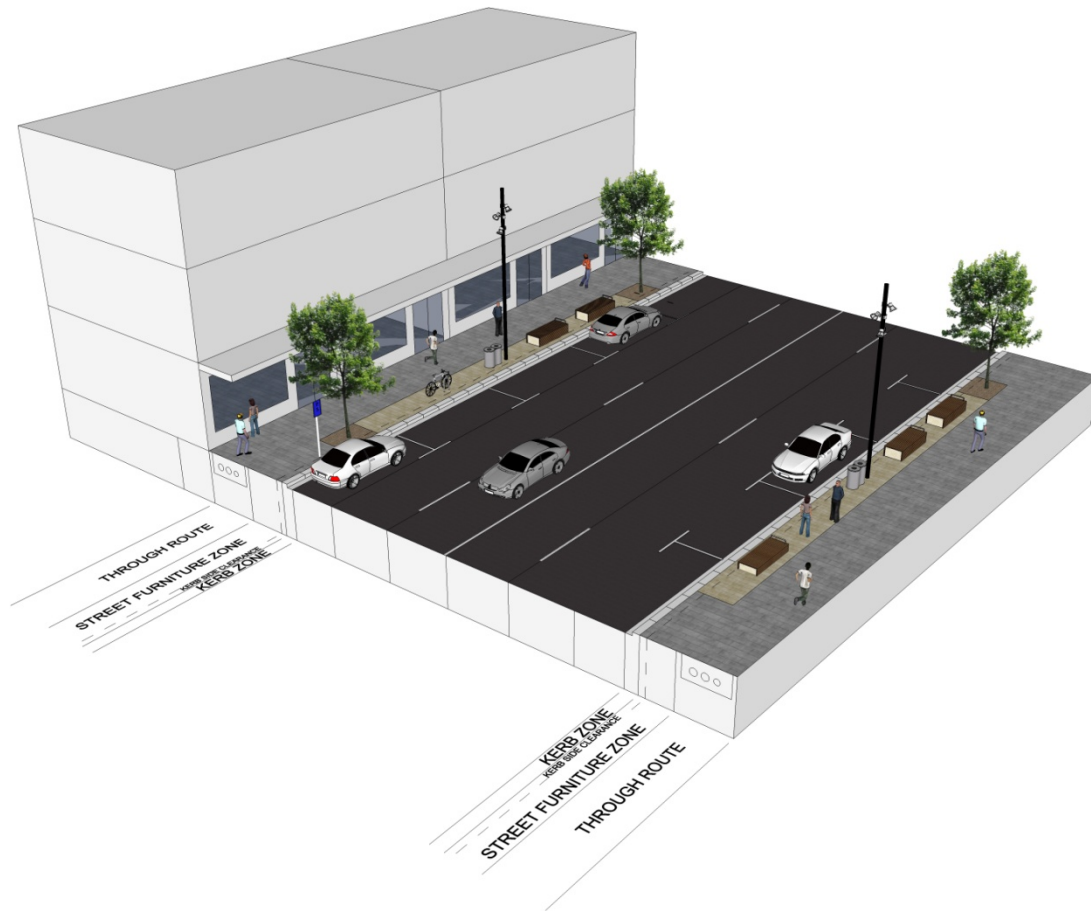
Typical Spatial Arrangement - Urban Arterial Street without Frontage Zone
